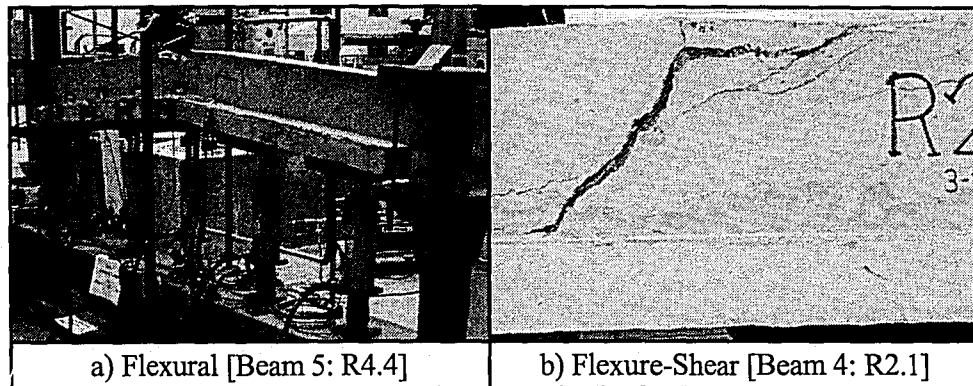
Typical Five-Point Loaded Specimen Failures
